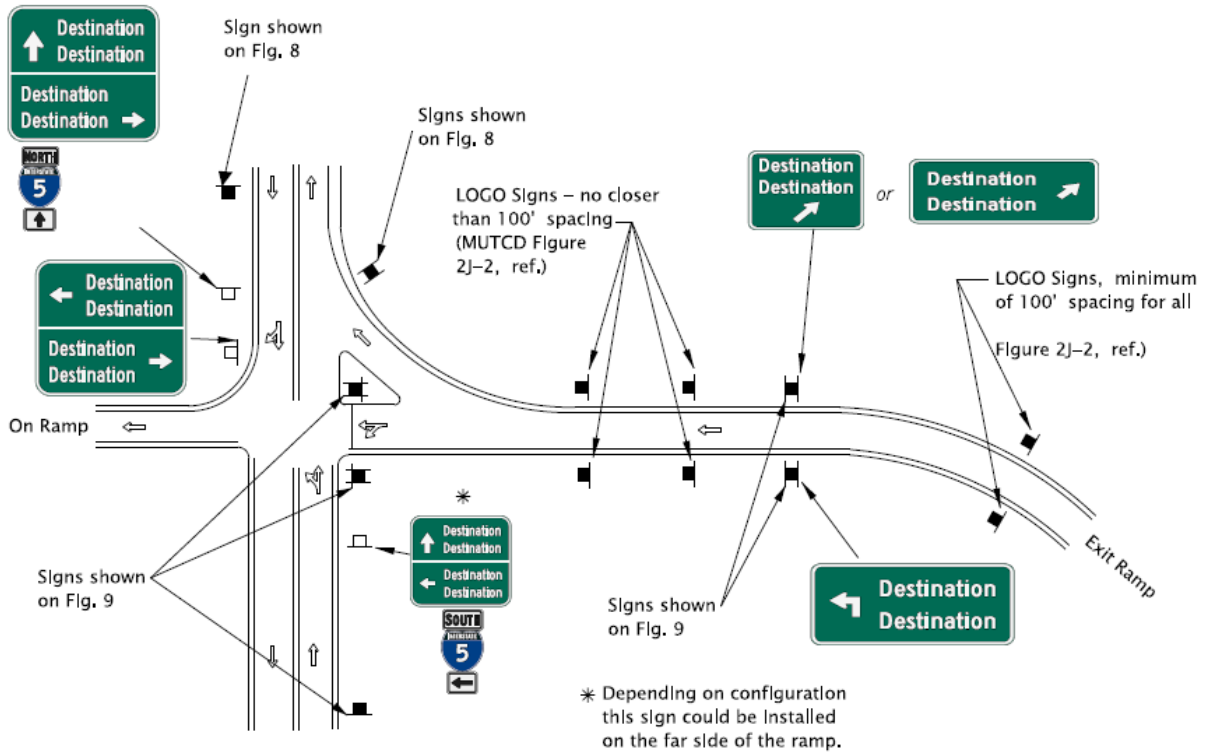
Typical Signing for Exit Ramp with Right Turn Lane
